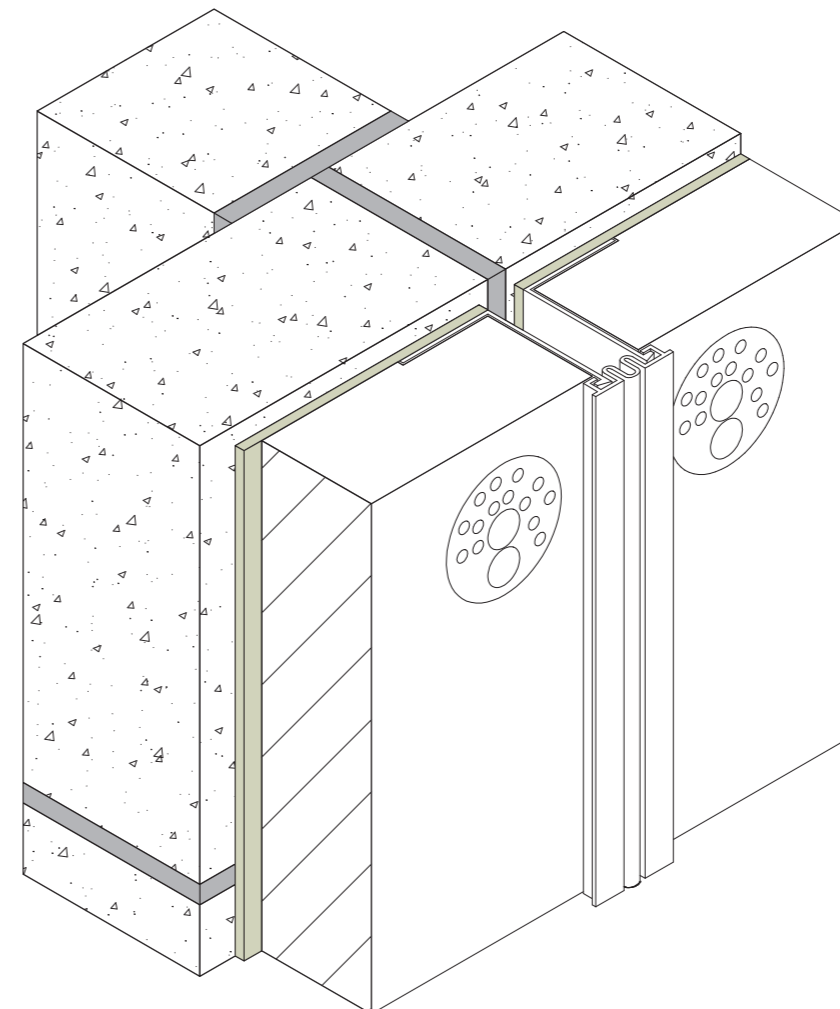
Fire Barrier Layout Between Adjacent Dwellings
